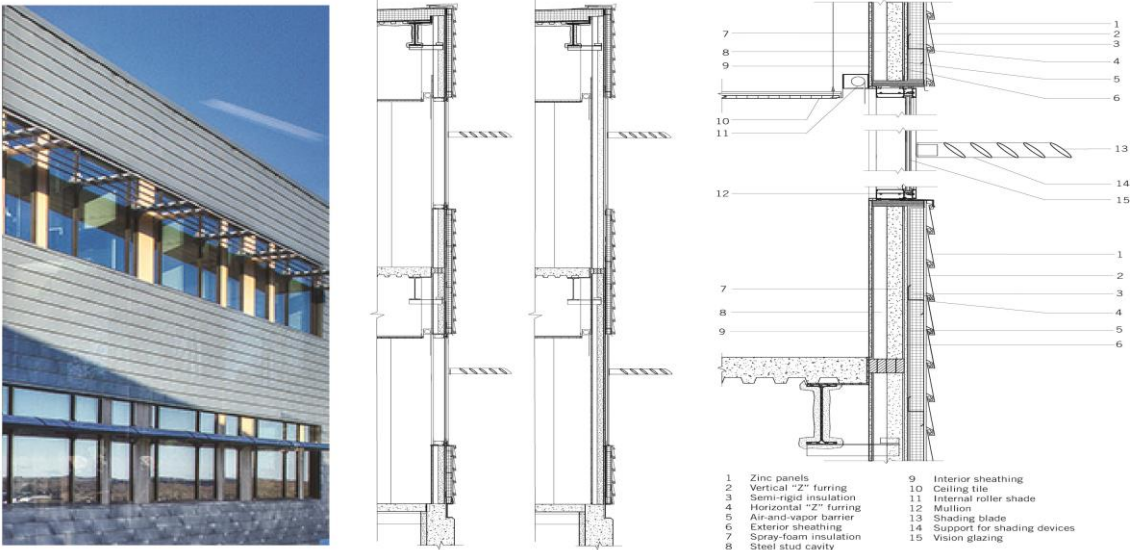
Elementary School showing the zinc siding and horizontal sunshades of the south facade, and the curtain wall of the east and west facade.
